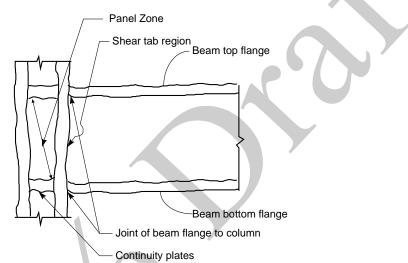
Observation Zones for Fire Proofed Beam-Column Connections
